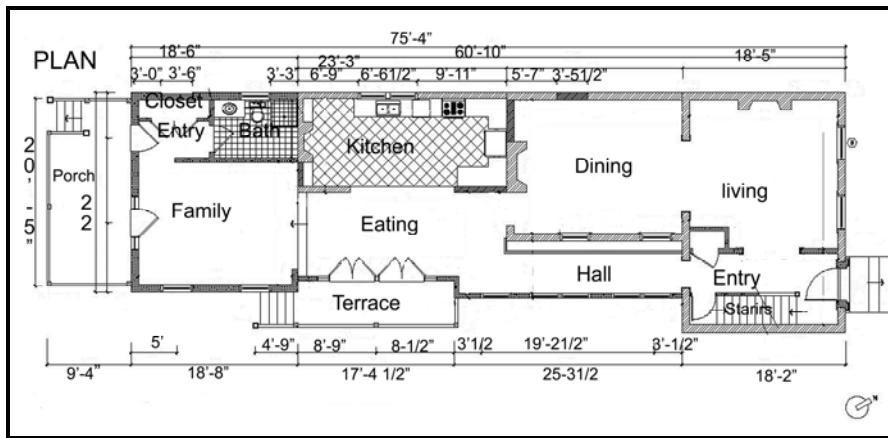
Samples of the types of documentation that might be required for review: architectural plans for each elevation, site plans, and detailed drawings.
